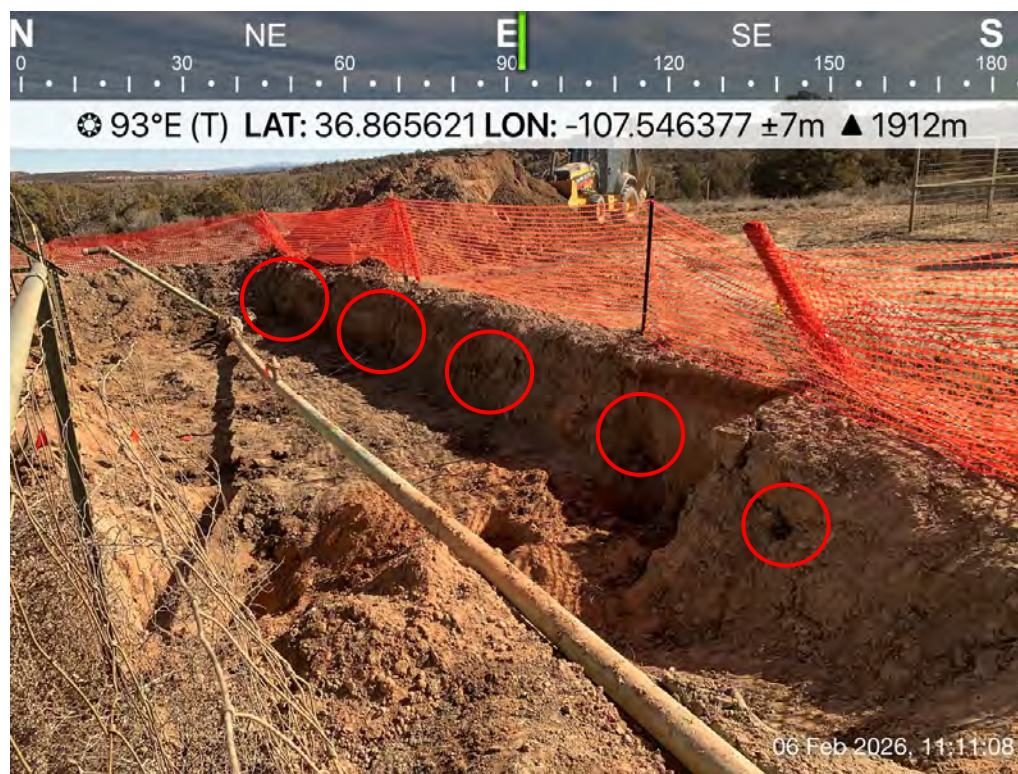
SS13 collected as a 5pct sample from the southeast sidewall of the POR excavation.
